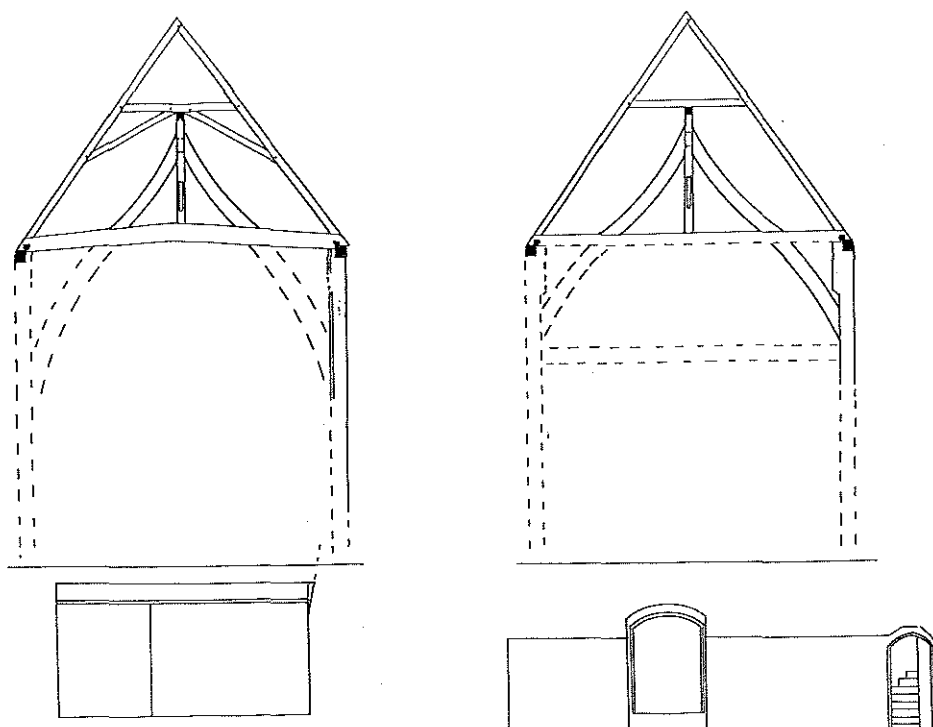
Longitudinal section of Building A (*Morriss 1995*)
